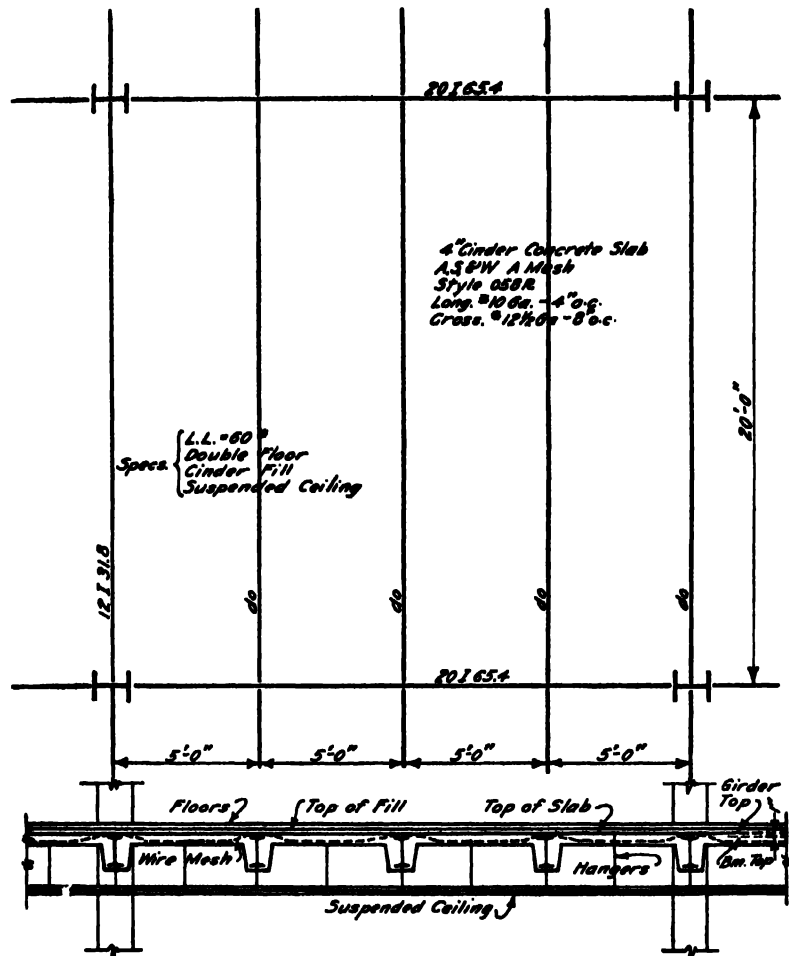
ONE-WAY CINDER CONCRETE SLAB PANEL, BEAMS AND GIRDERS OF STEEL
